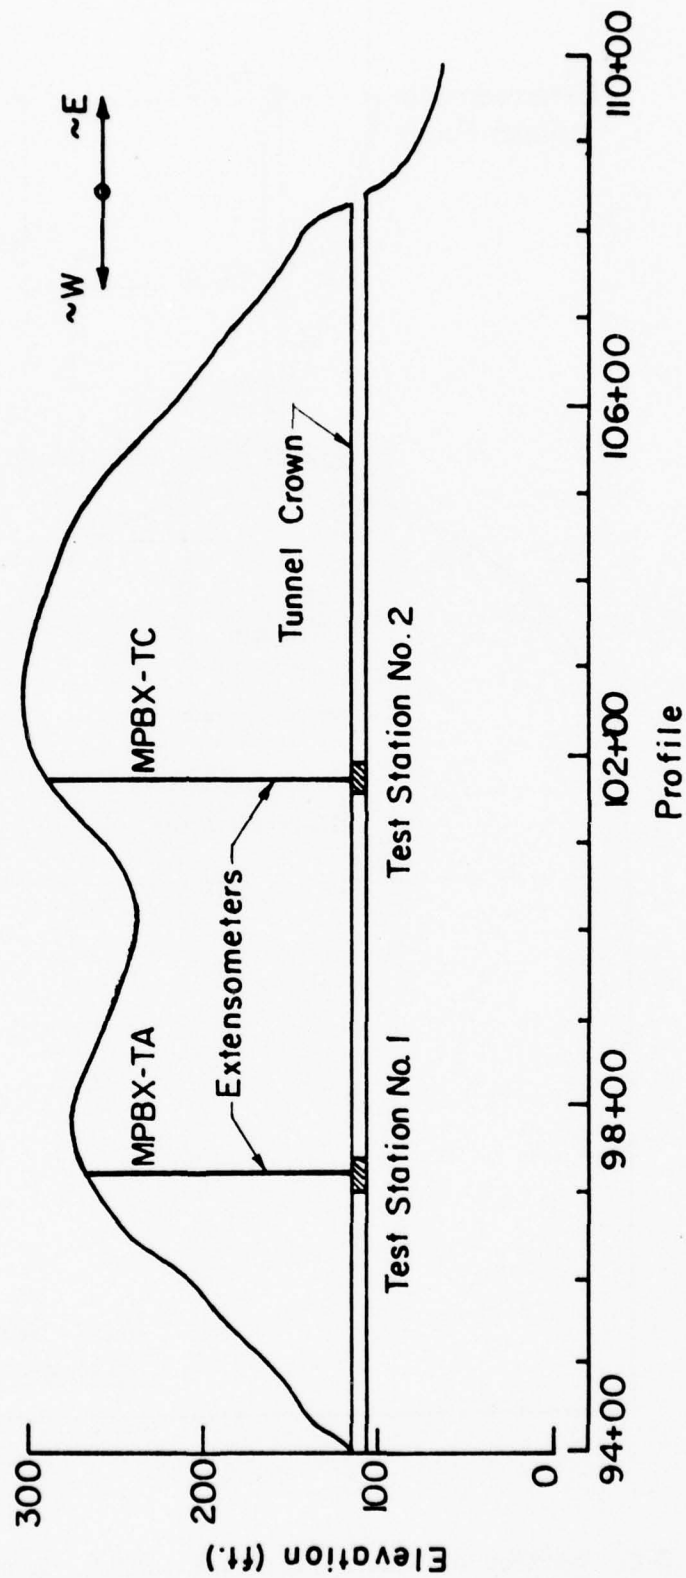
Profile of Burlington Northern Railroad Tunnel, North Bonneville, Washington, and Test Station Locations
